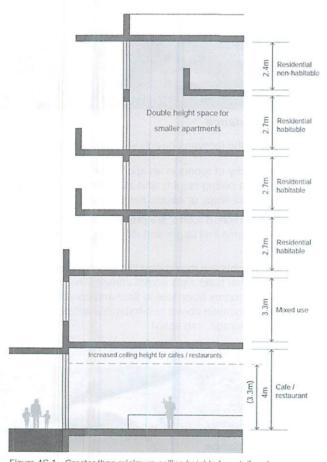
C.1 Greater than minimum ceiling heights for retail and commercial floors of mixed use developments are encouraged to promote flexibility of use. Cafe and restaurant uses need greater minimum ceiling heights of 4m to allow for additional servicing needs
